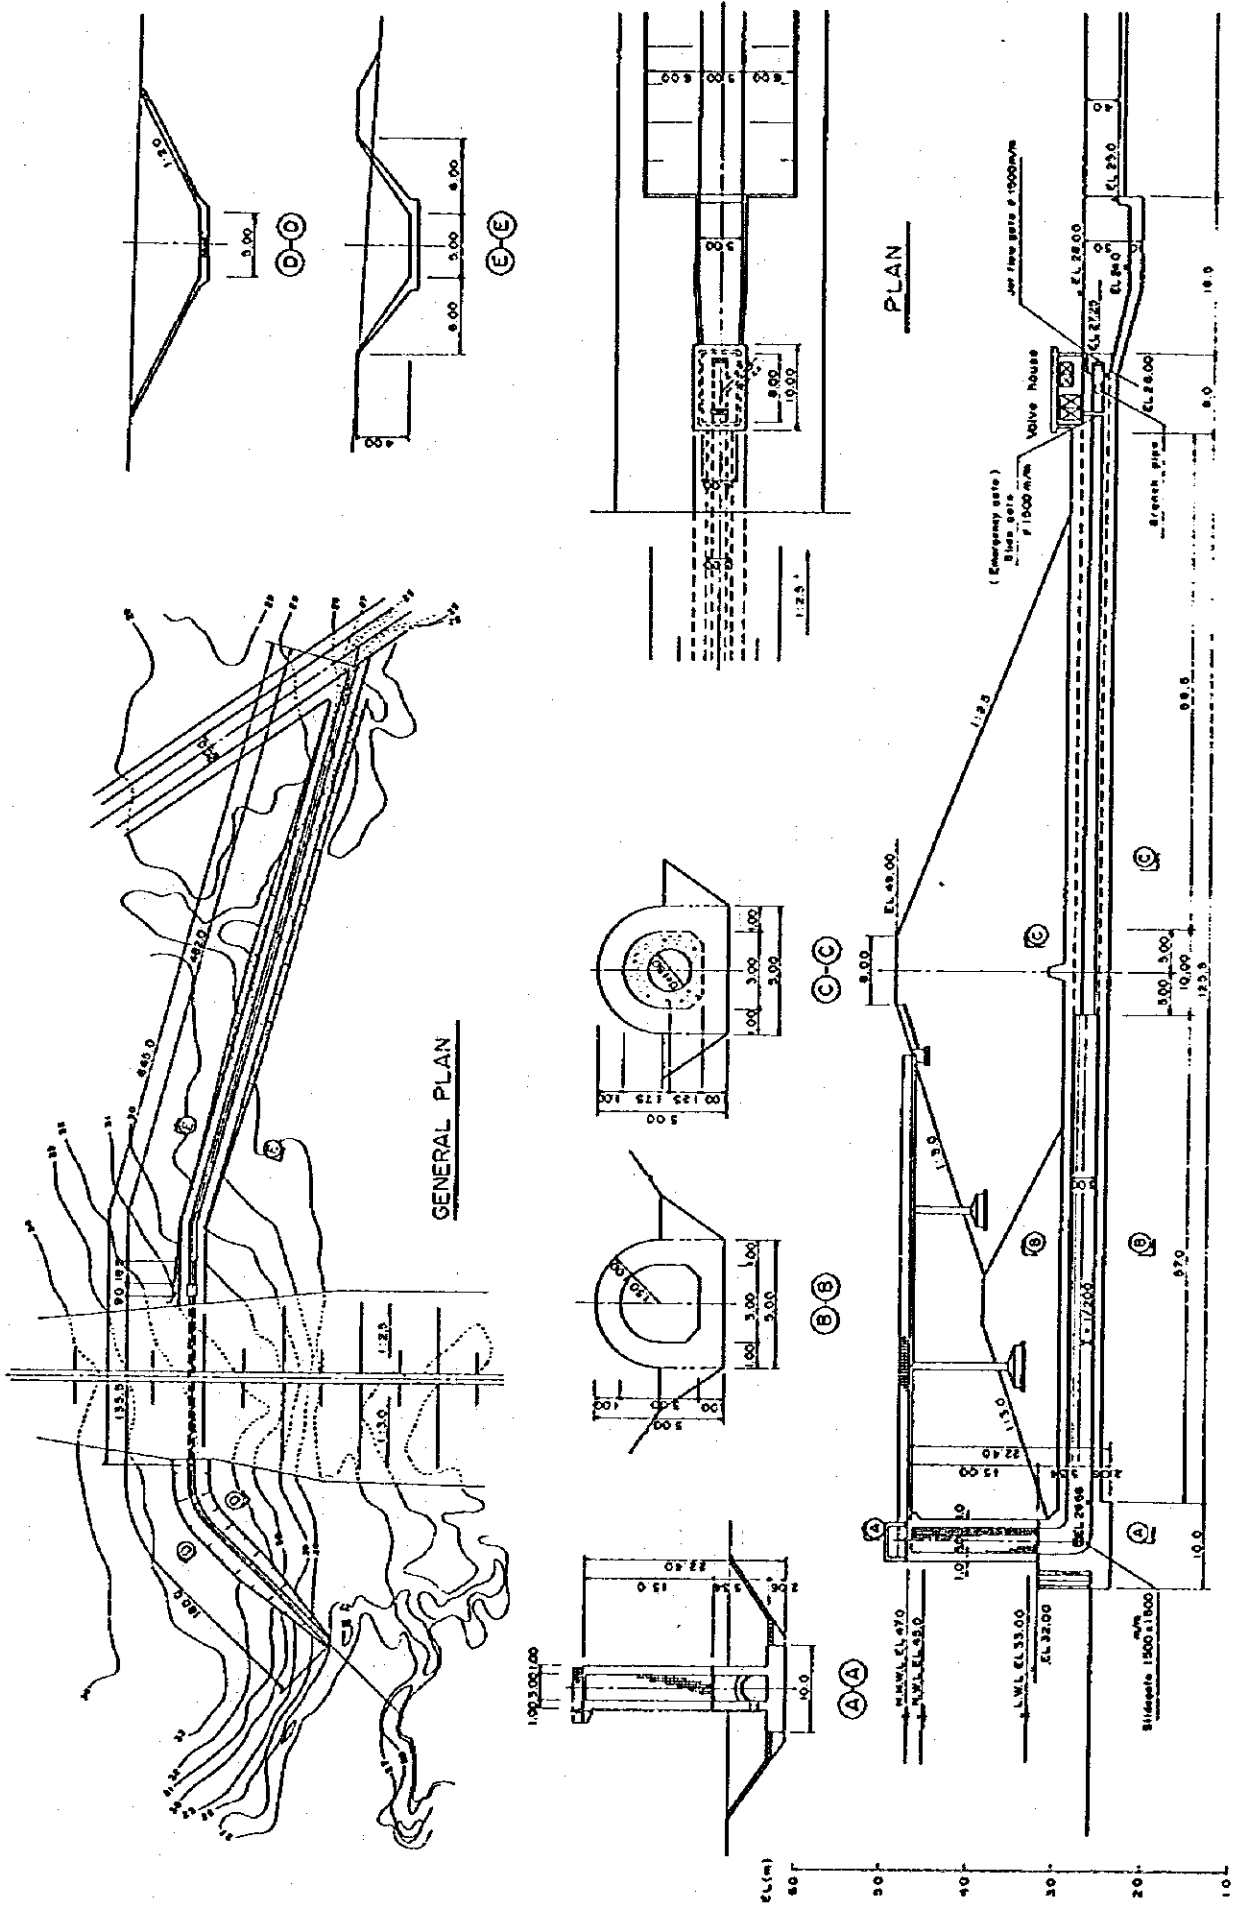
Details of Spillway of Nong Pia Lai Dam
